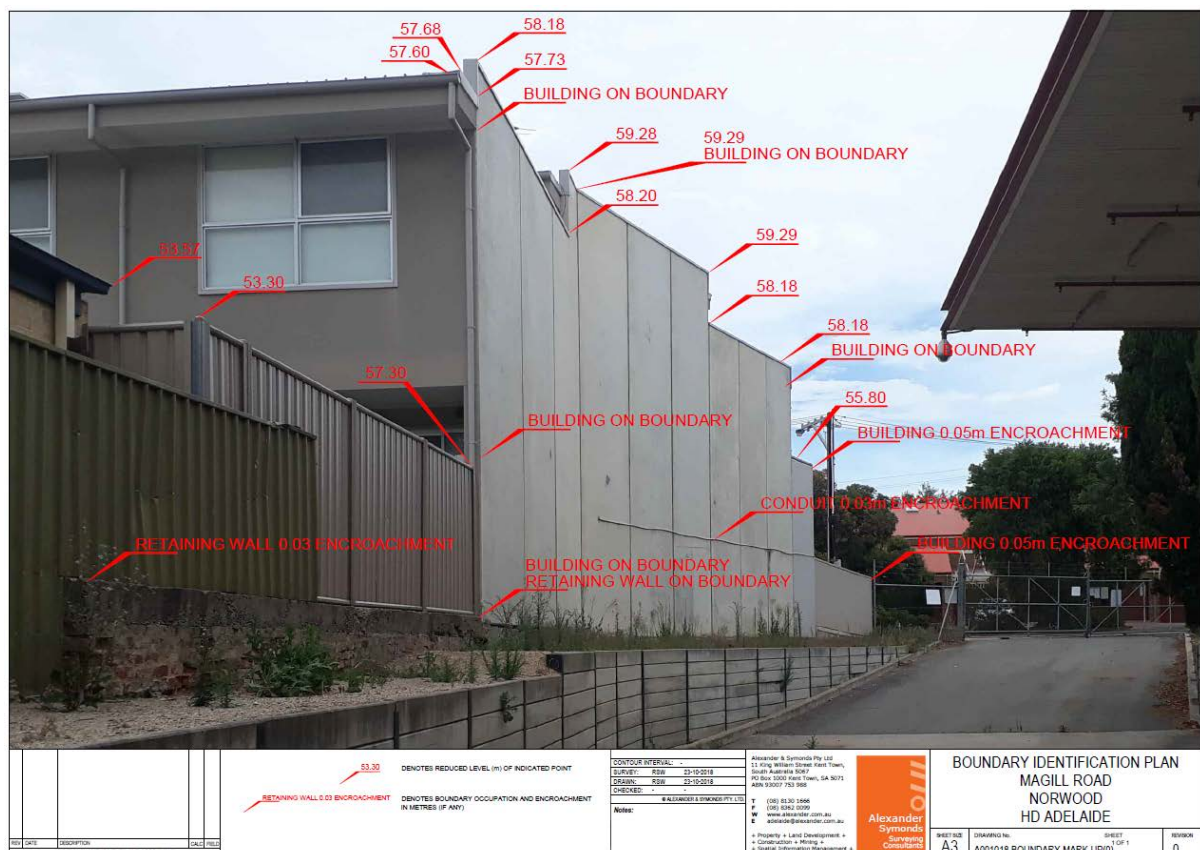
Encroachment of Adjoining Built Form into Subject Site
